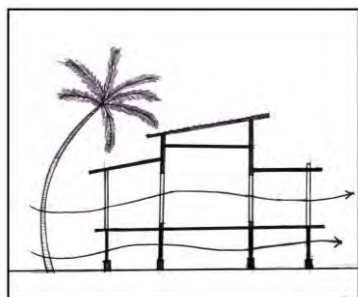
Plinth: Section shows Maximum opening and plinth height enhance air flow and prevent flooding
